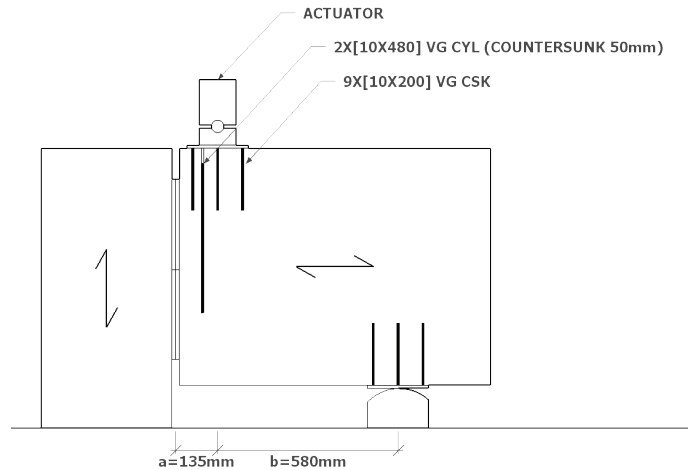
, Test setup geometry with reinforcing screws shown. Loading applied downward through actuator.
